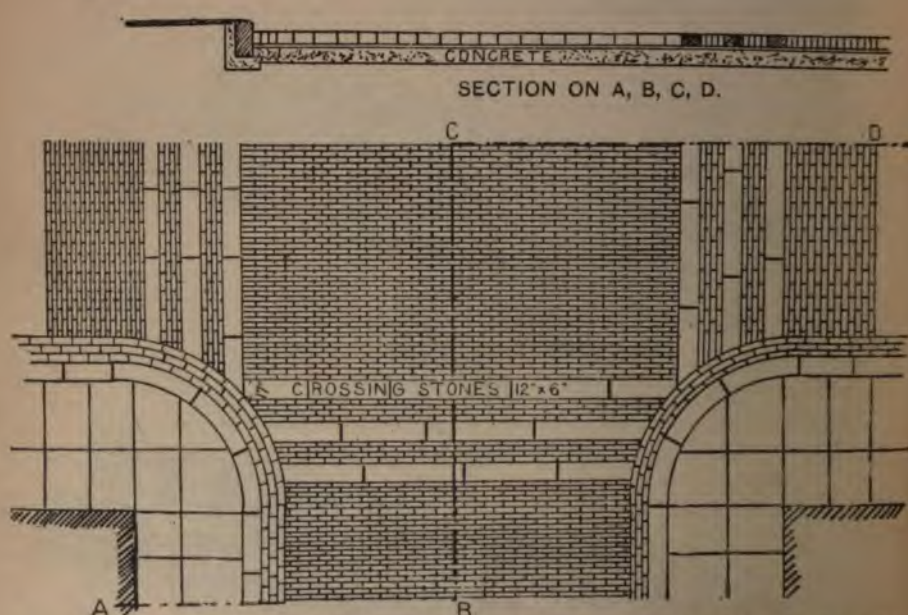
PLAN OF INTERSECTION PAVED WITH GRANITE BLOCKS
